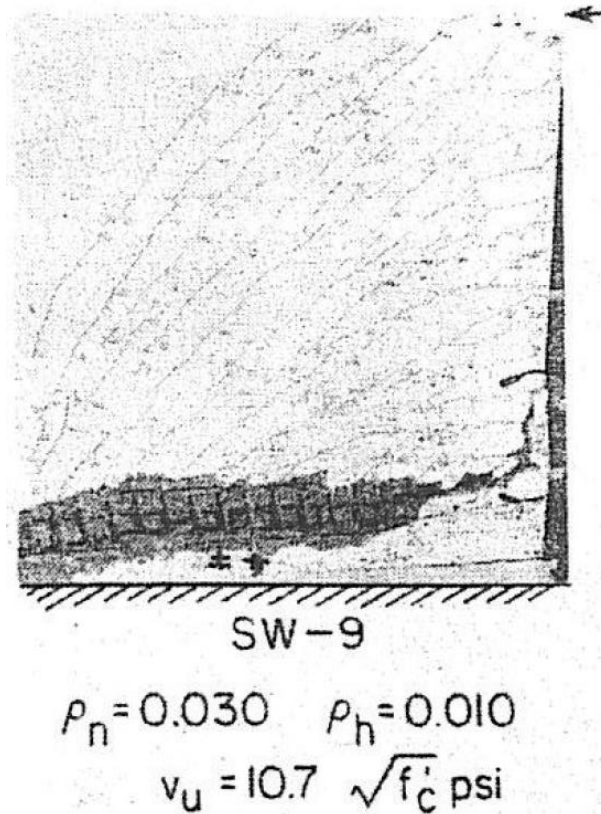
Specimen after testing (Cardenas et al., 1982)
